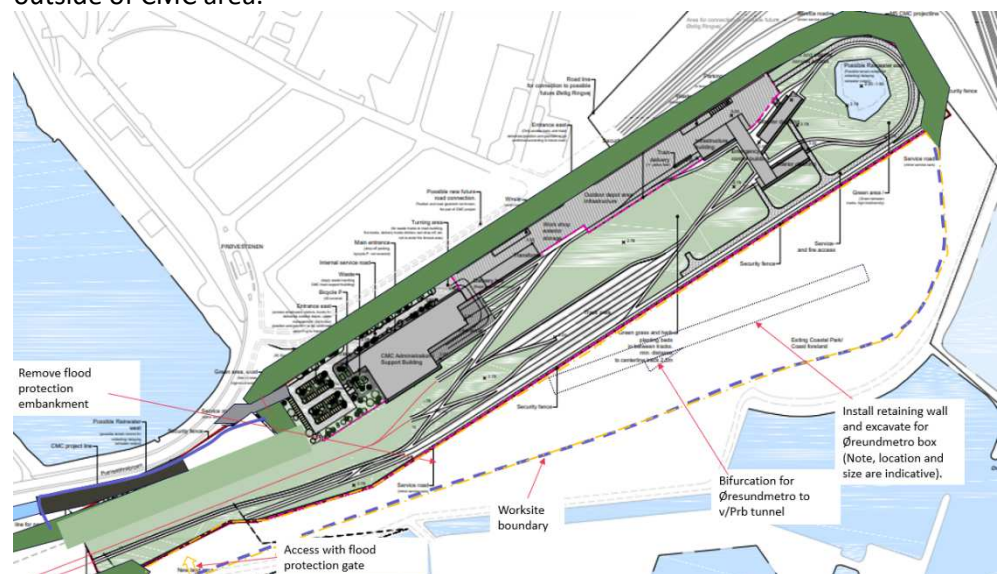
Phase 7 - Øresund metro Ramp Construction Sequence.
